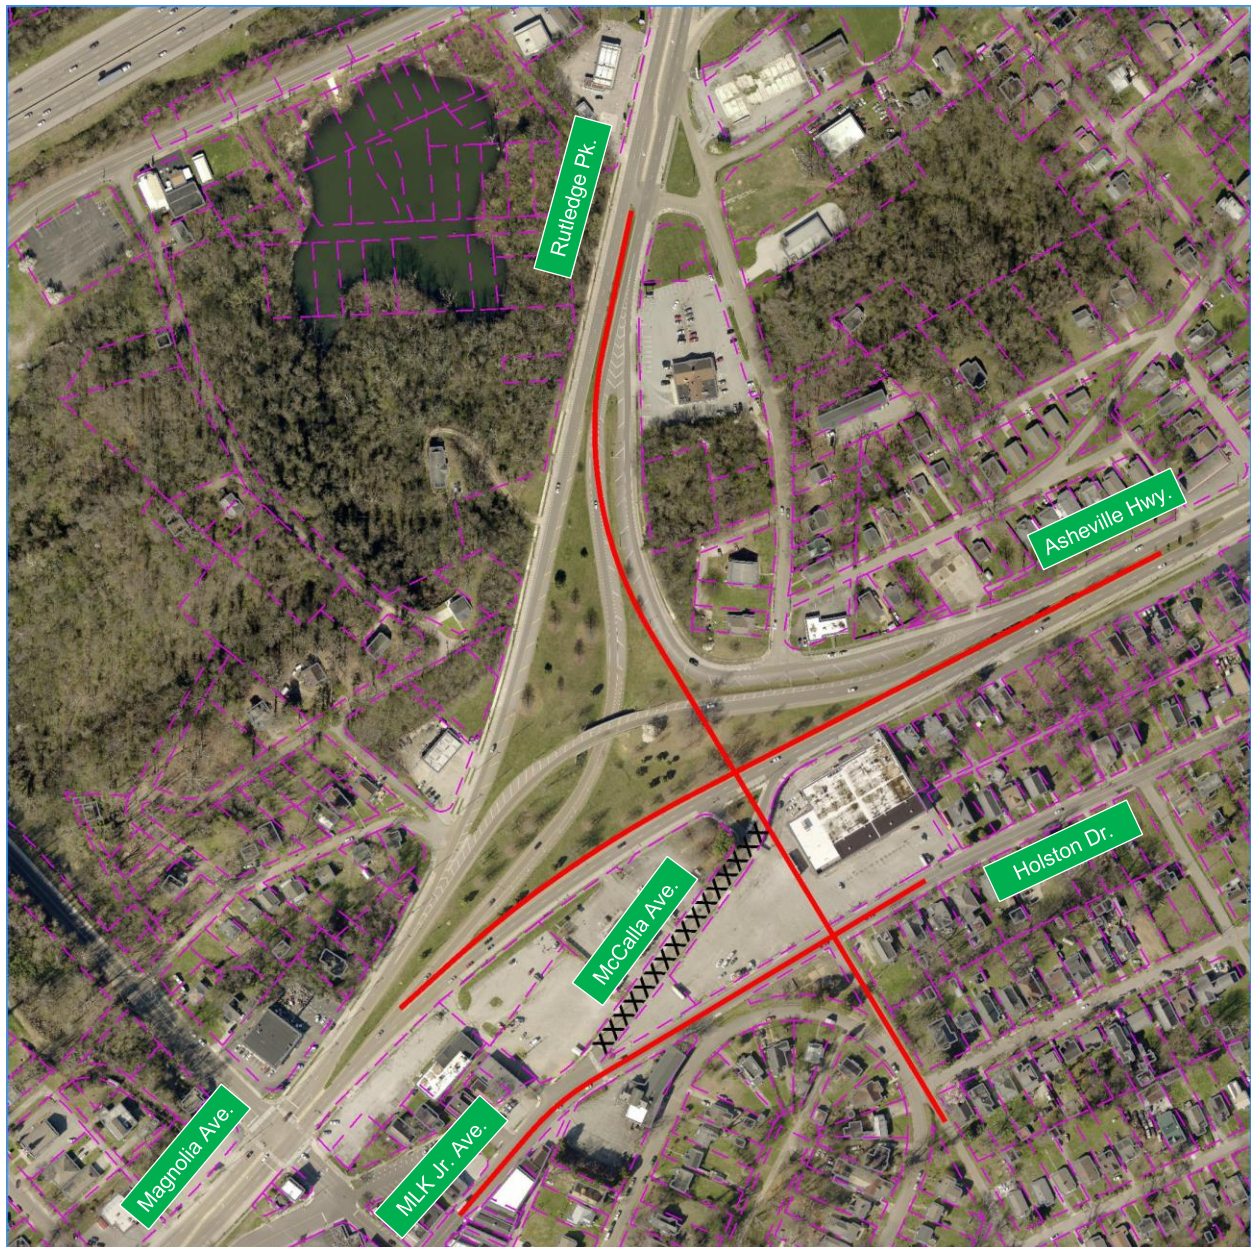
BUILD ALTERNATIVE SINGLE-LINE SKETCH
